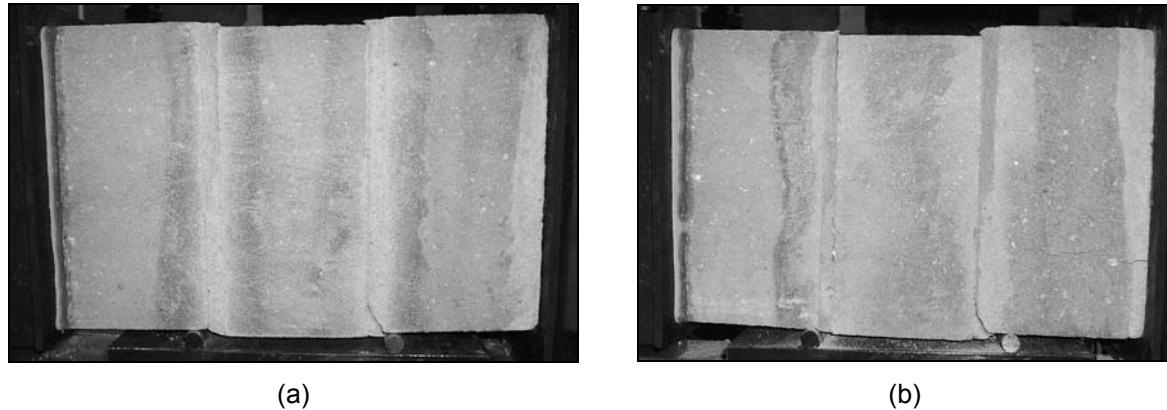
Failure mode of shear tests: (a) sliding and (b) sliding with horizontal crack.
